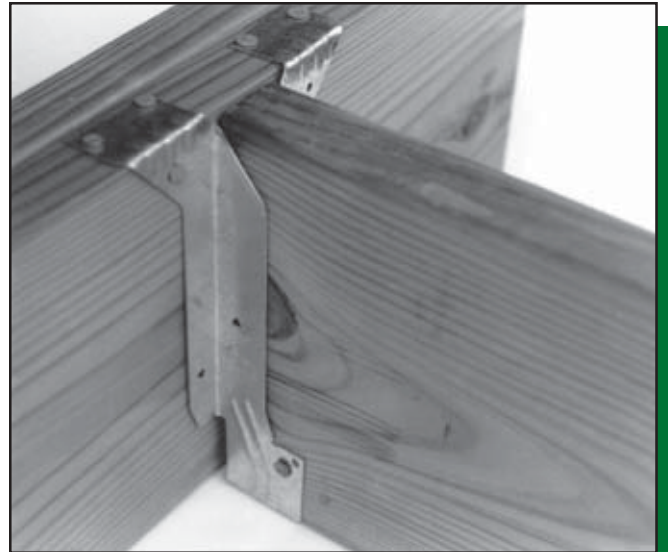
Supporting joists with truss hangers helps keep a boardwalk closer to the ground.
